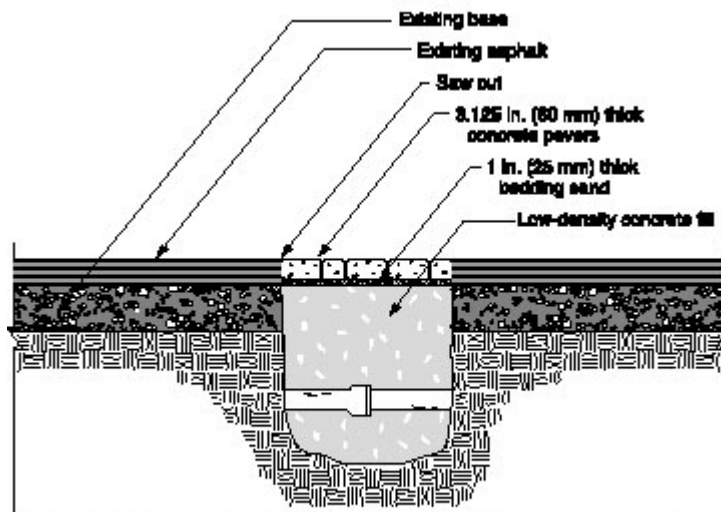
Cross section of utility cut repairs with concrete pavers in London, Ontario.
